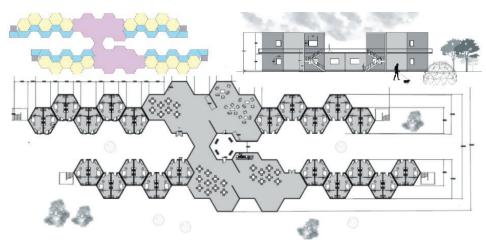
Scheme of the first floor, plan section-first floor, Elevation. Design by Gabin Peinado Paula Source: Gabin Peinado 2017.
